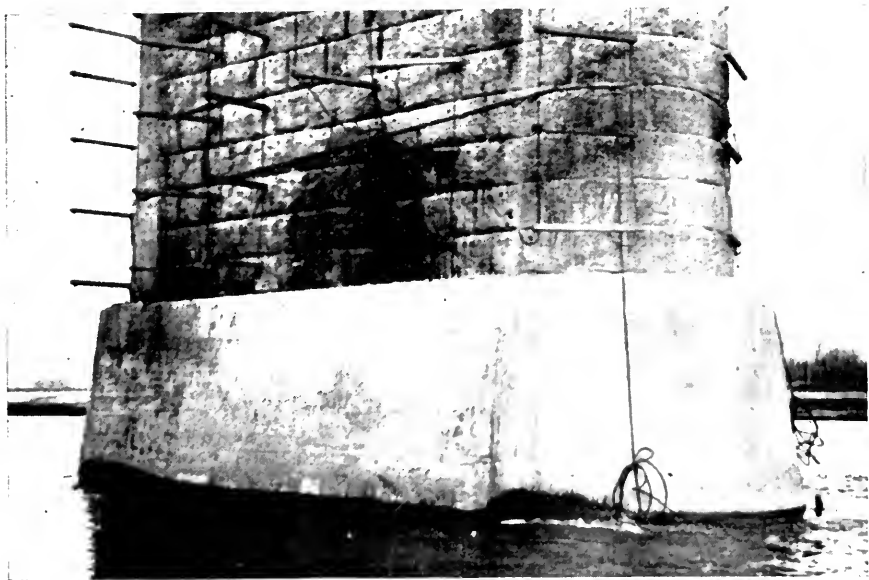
Interior of the Pier Was Grouted and the Base Was Encased with Reinforced Concrete.
